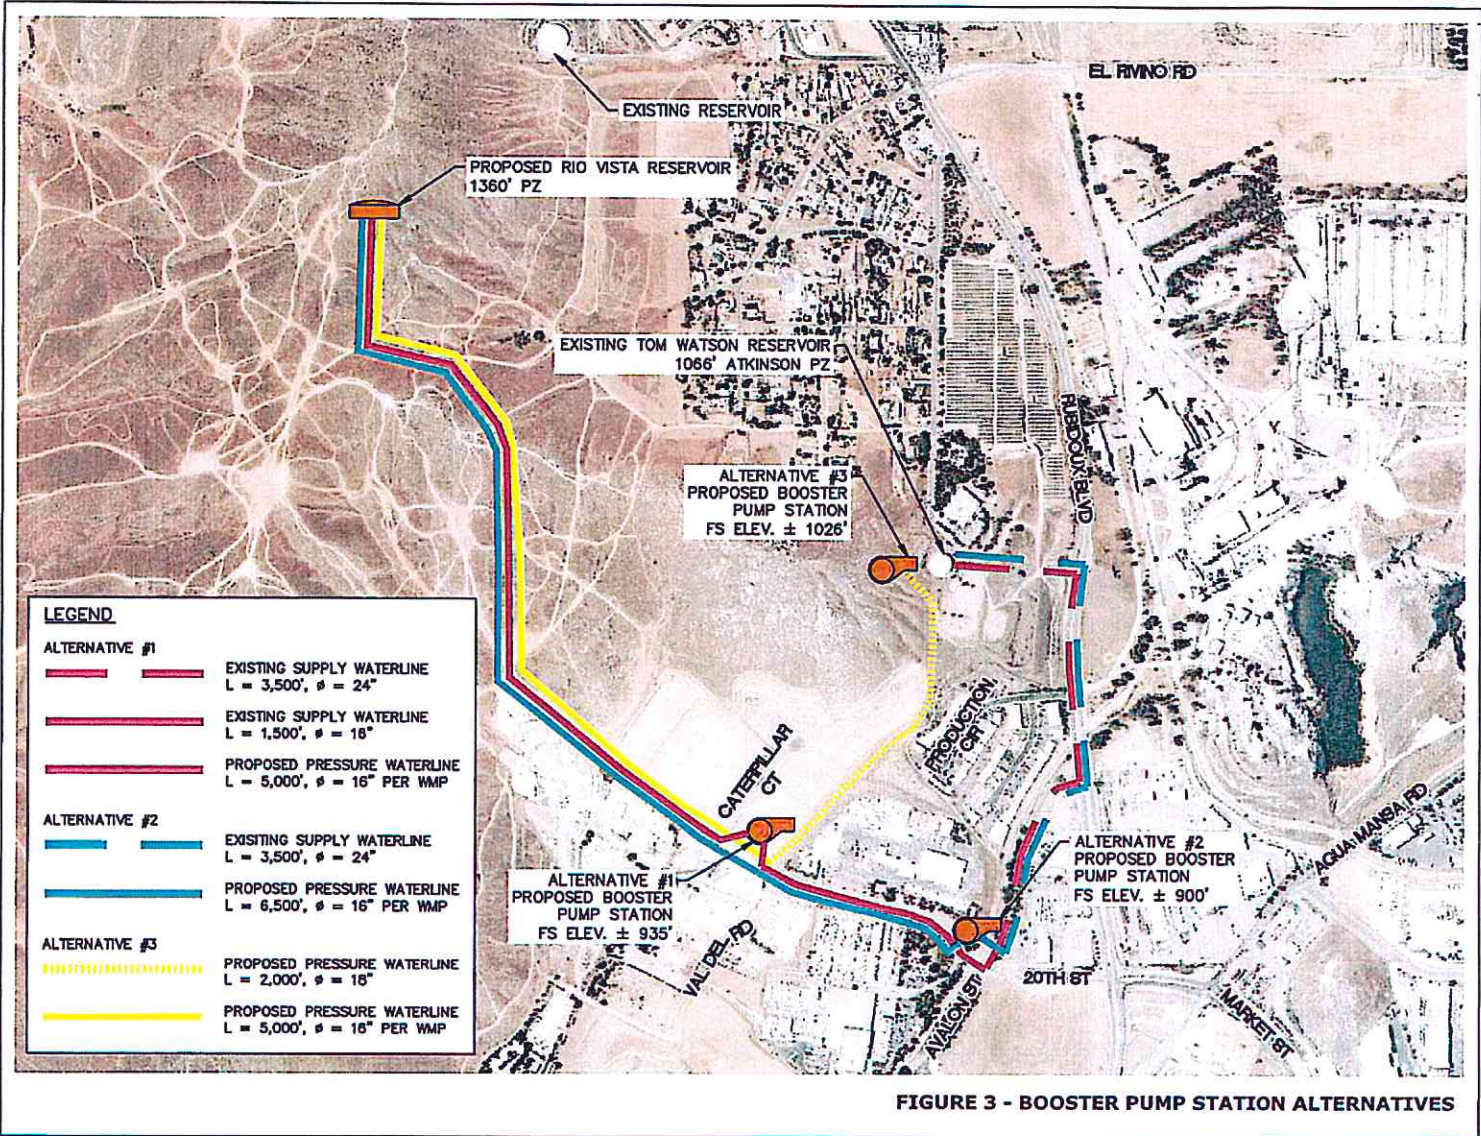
BOOSTER PUMP STATION ALTERNATIVES
